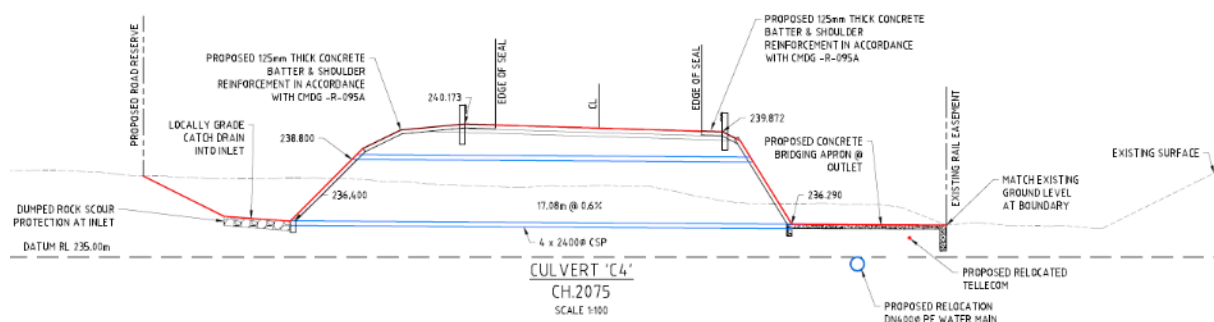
Conceptual design of proposed Saraji Road culverts along Drainage line 1
